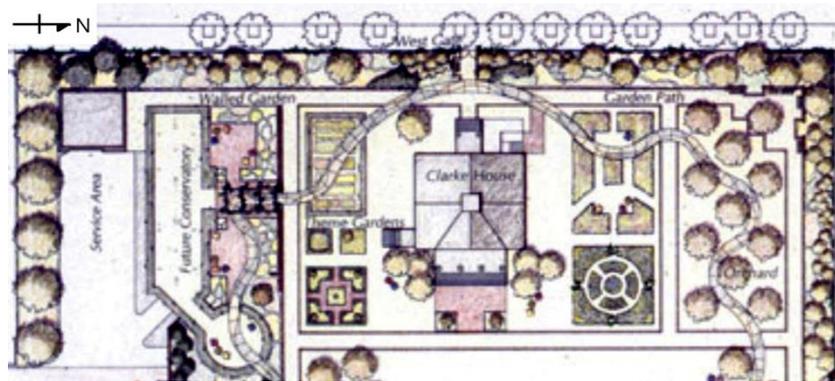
Mimi McKay’s site plan of the park surrounding the Clarke house. [27]
